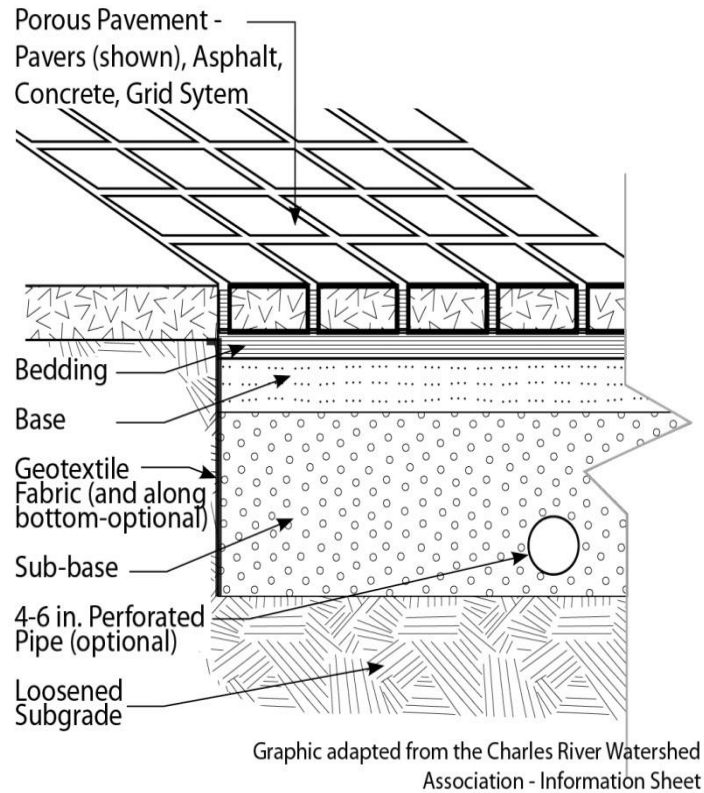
Schematic of typical permeable pavement surface and subgrade.
